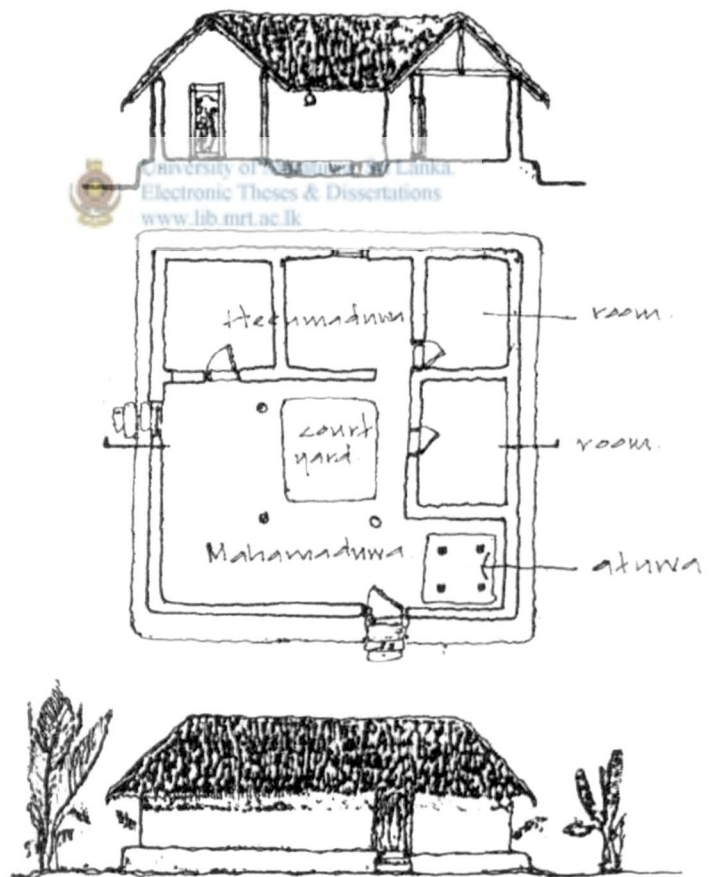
Plan, Section, elevation, of the peasant dwelling
